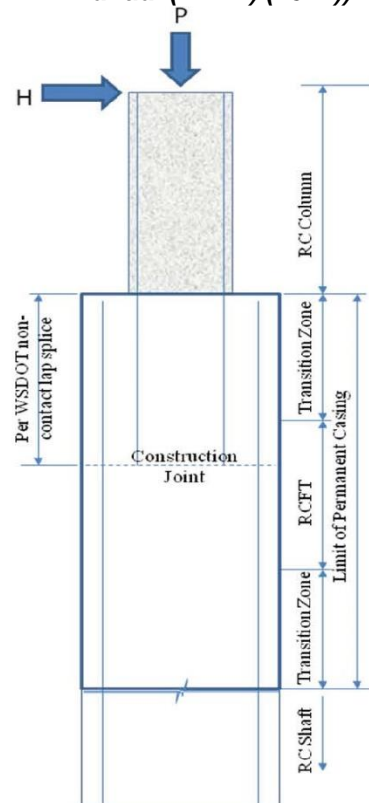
Typical detail of drilled shaft diameter greater than column diameter (From Texas DOT Bridge Standards (2012))
